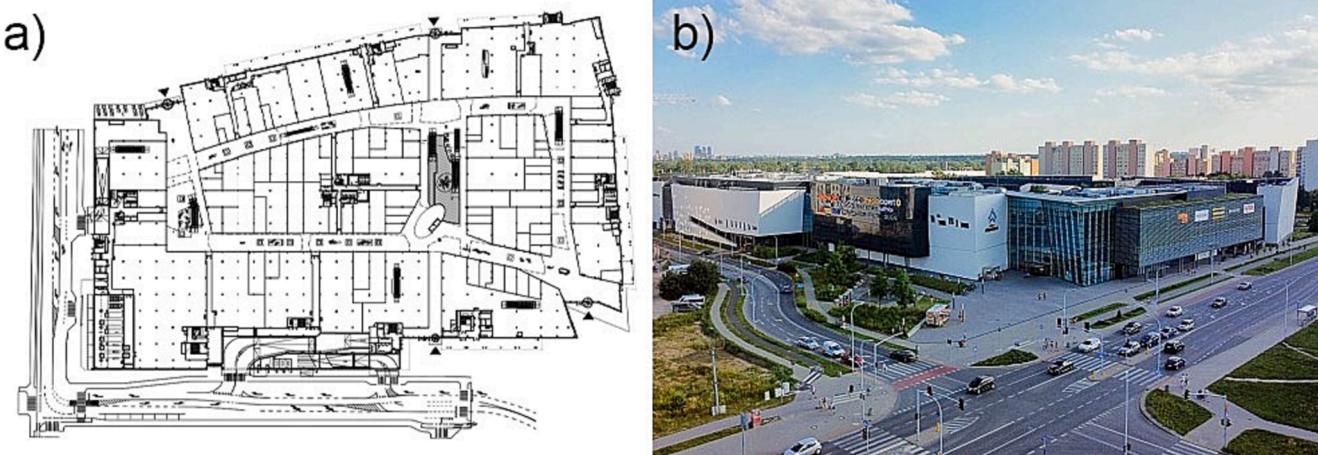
Galeria Pólnocna mall: a) plan; b) view of the building.
